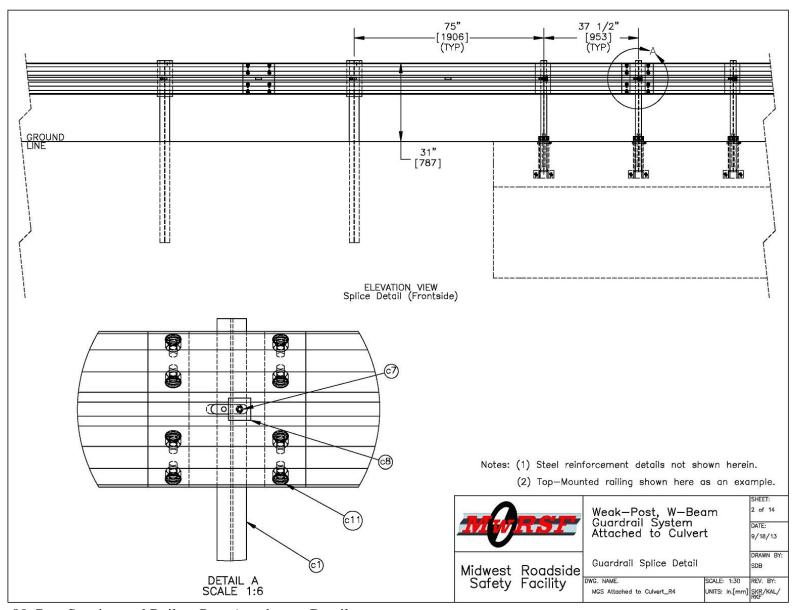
Post Spacing and Rail-to-Post Attachment Details
